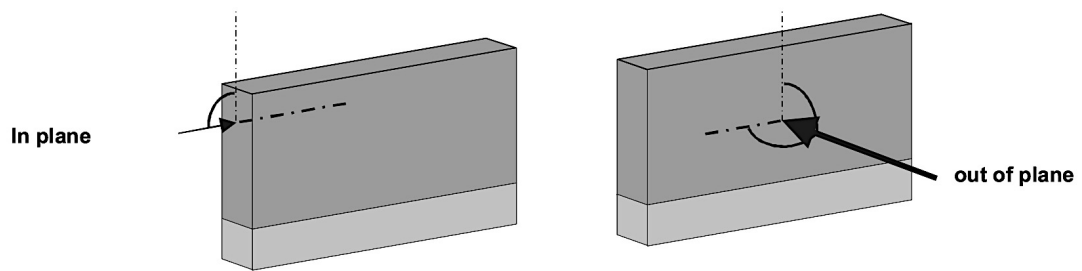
In-plane and out-of-plane directions for walls [49]
